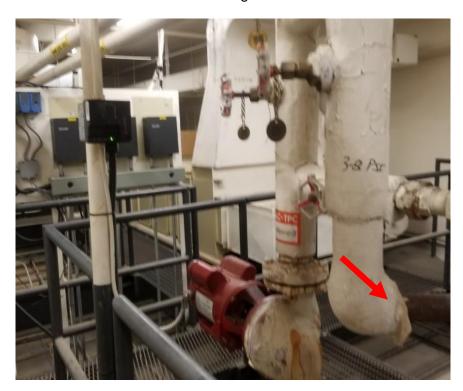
Mezzanine above boiler room, right side of catwalk, central-west, 1 poor condition fitting.
